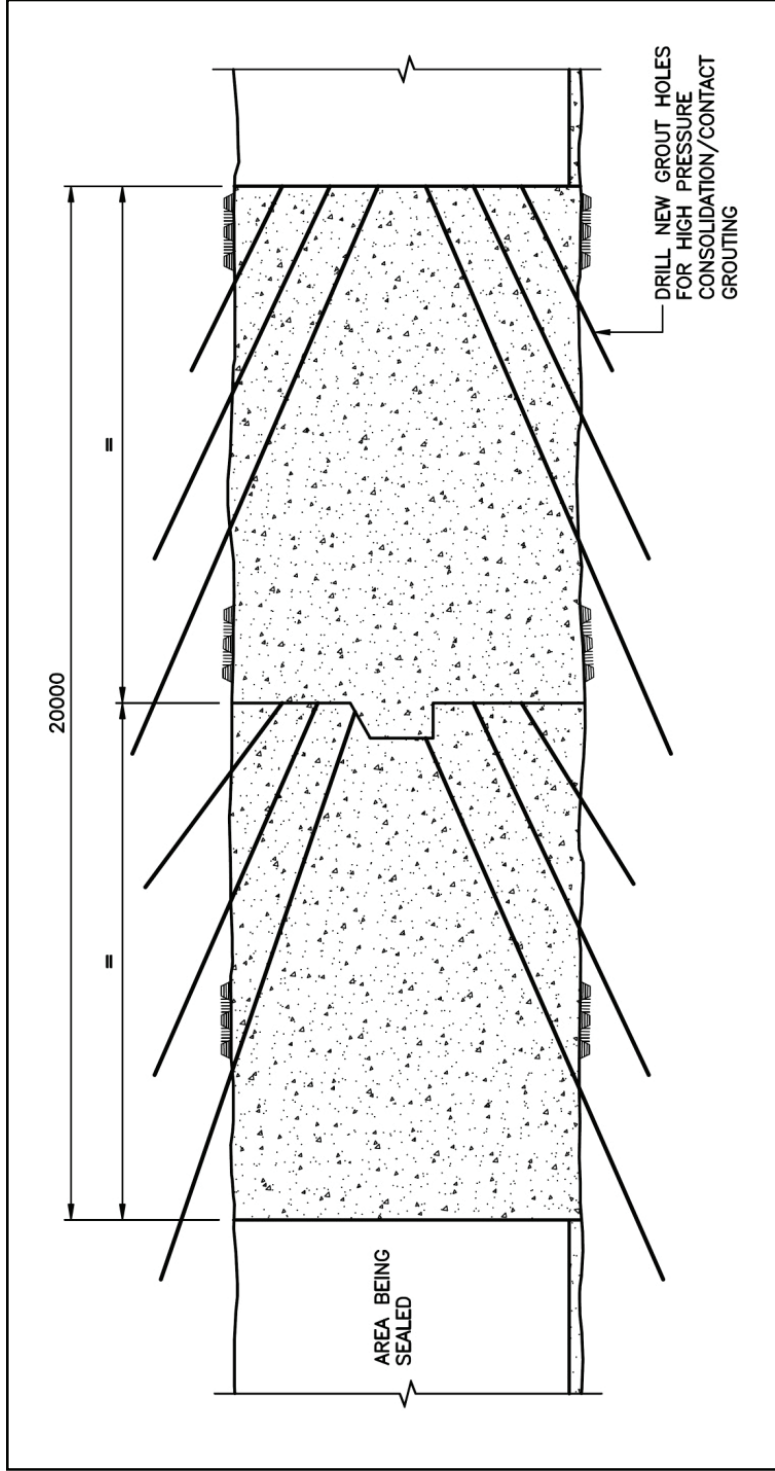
Conceptual Design for Access Tunnel Closure Wall
